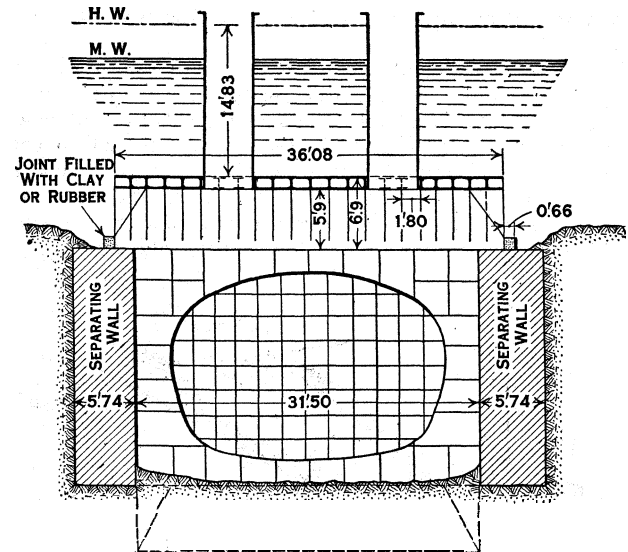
TRANSVERSE SECTION OF COFFERDAM SUPERIMPOSED OVER JOINTS BETWEEN CAISSONS IN TUNNELS FOR THE METROPOLITAIN UNDER THE SEINE
